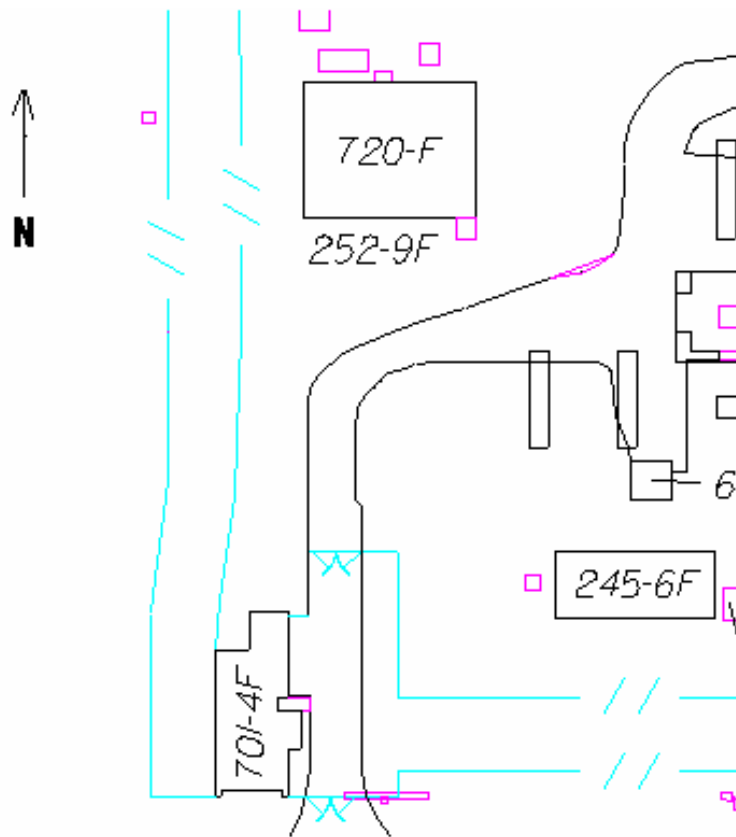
Layout/Location of Building 720-F and Adjunct Facilities
